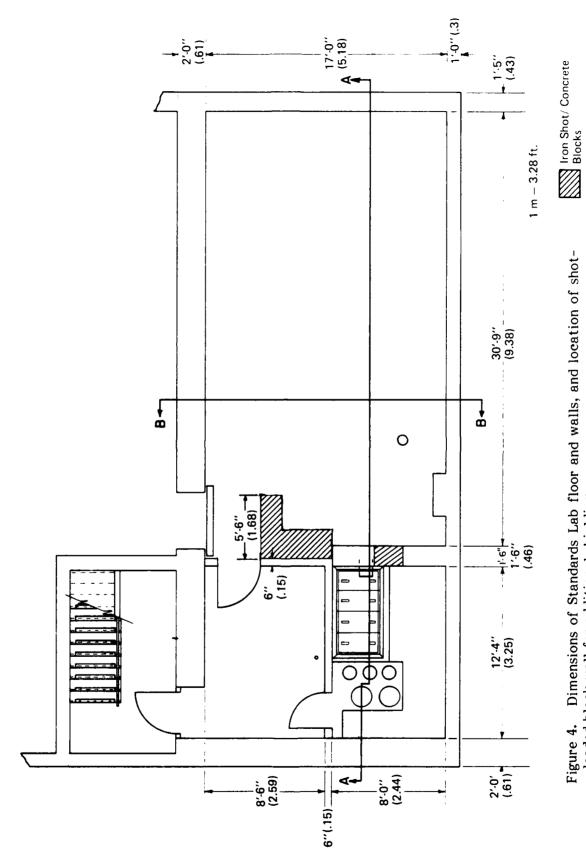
Dimensions of Standards Lab floor and walls, and location of shot-loaded block wall for additional shielding
